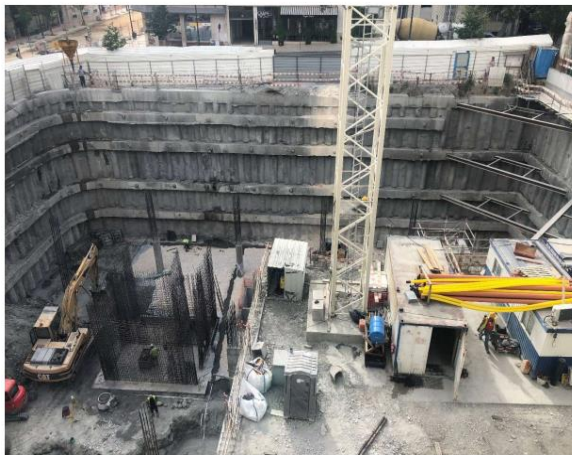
WEST SIDE OF THE EXCAVATION
